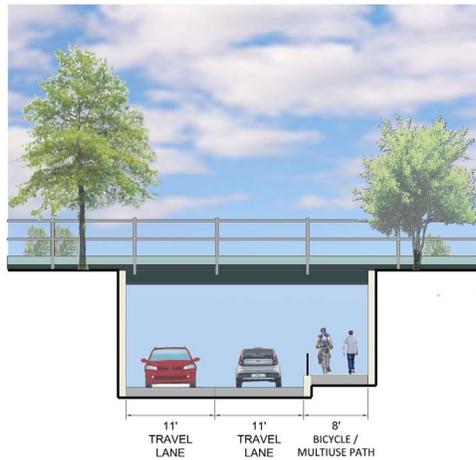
10th Street Underpass (8th Avenue to 7th Avenue)
